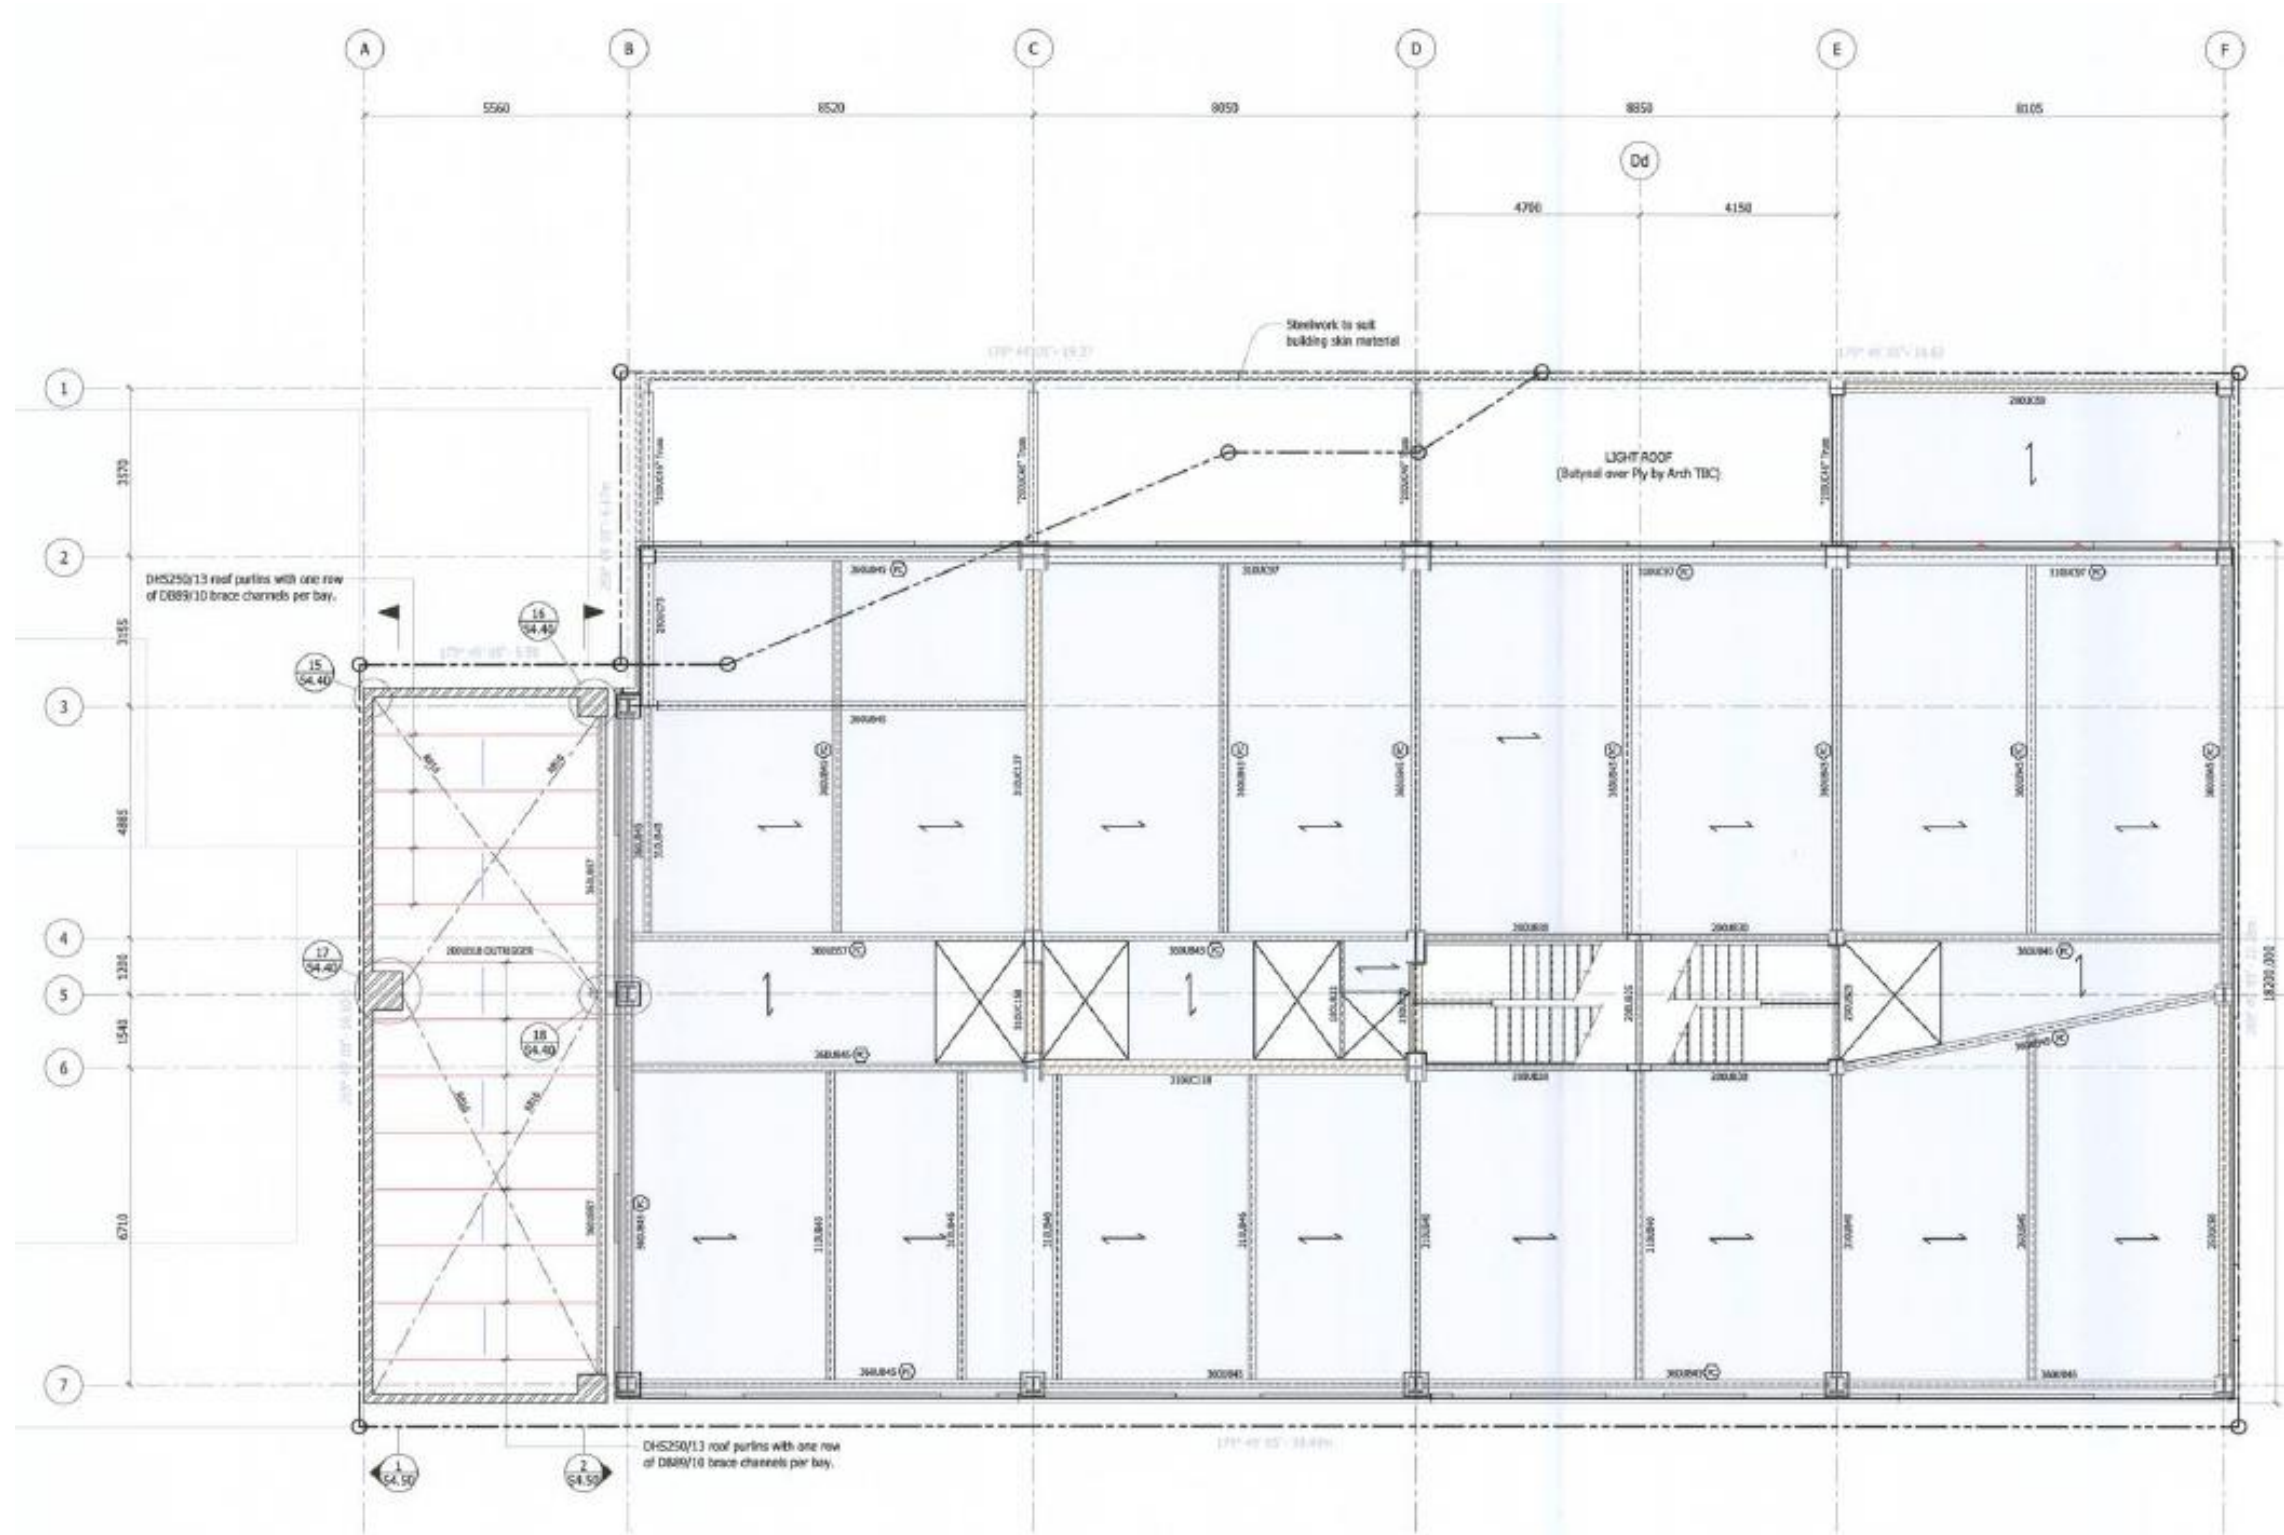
Structural Plan Level 6 (Christchurch City Council 2016c)
